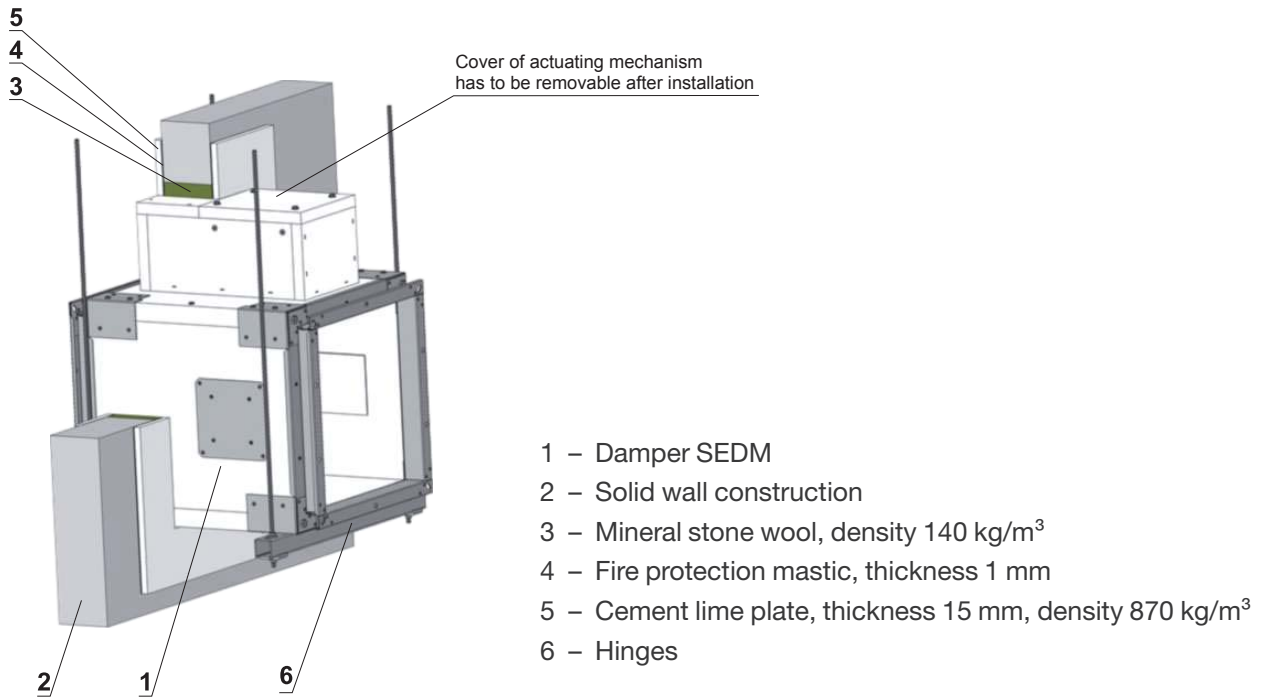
Example of installation in solid wall construction of fire compartment - horizontal blade axis position
